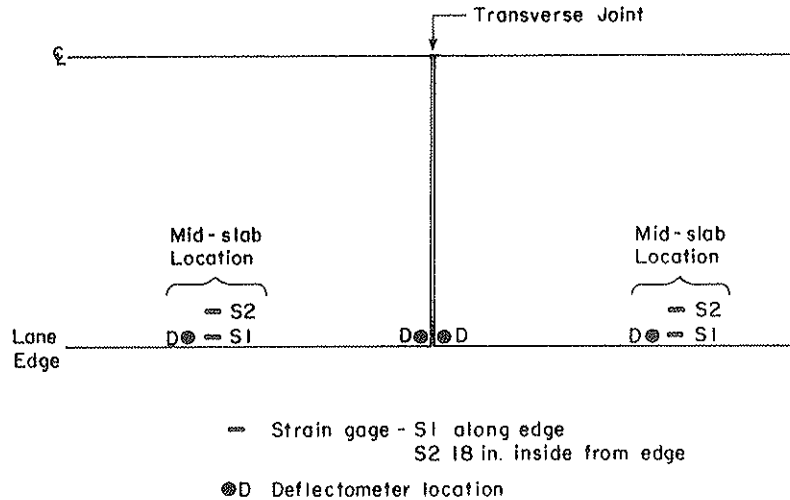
Typical instrumentation for sections 1, 2, 3, and 5.
